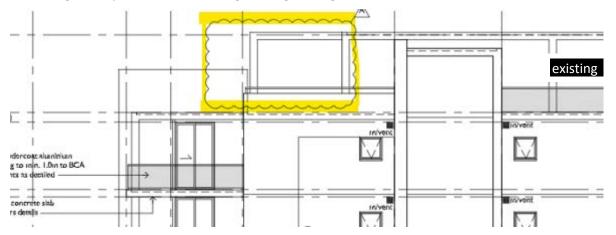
Extract from elevation plan showing extent of proposed awning adjacent to existing roof top structures and awnings
